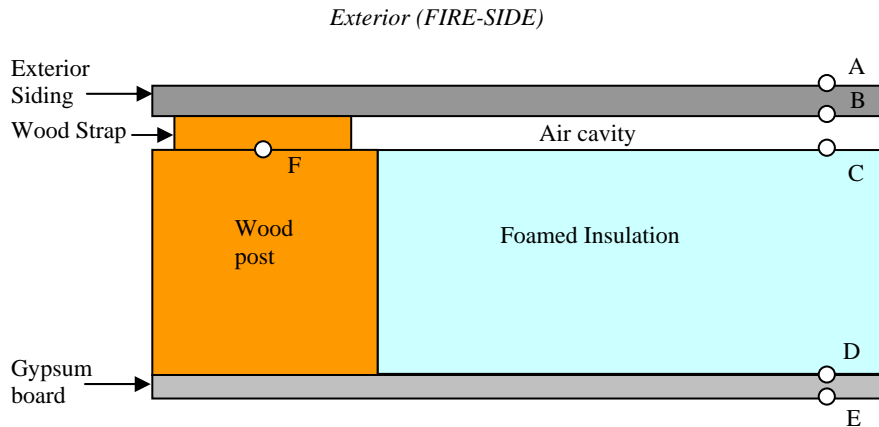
Structure of the exterior wall (A to F indicate thermocouple locations).
